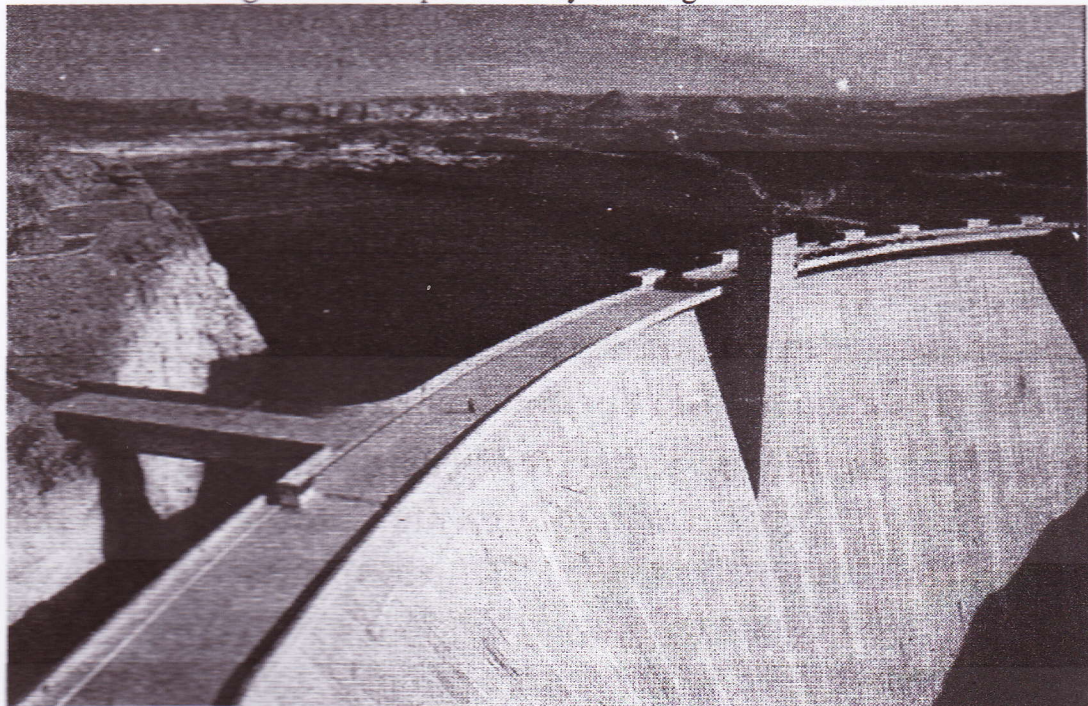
A typical dam- a multipurpose project- requires use of mass concrete and low-heat Portland cement
